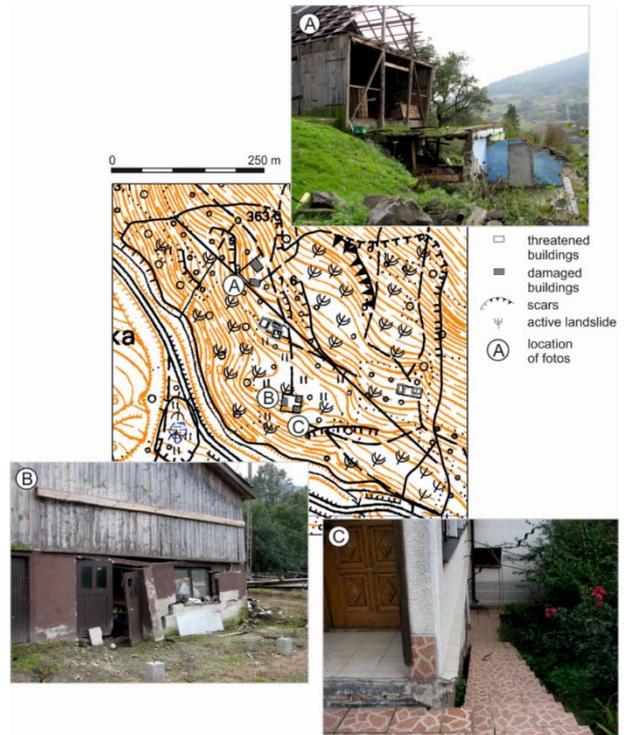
Sample landslide with location of buildings shown; A, B, C – damaged buildings. Sketch by E. Gorczyca.
